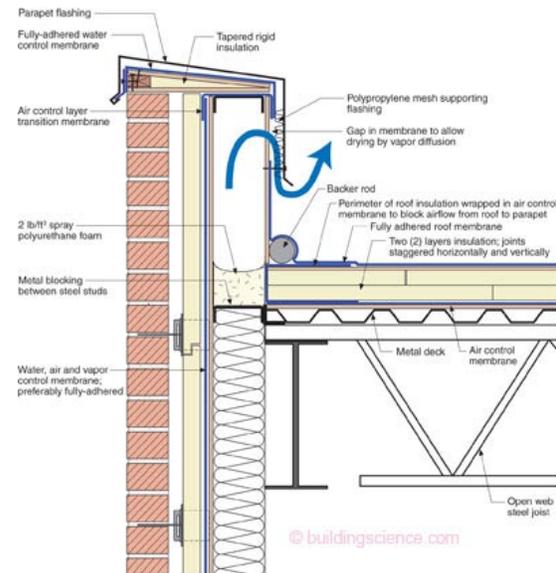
The Balloon Framed Steel Stud Parapet— This is the ugliest parapet to get right. Notice the use of spray polyurethane foam, the high density stuff, to provide air control layer continuity across the balloon framed exterior steel stud wall. The spray foam is supported by horizontal bridging or metal blocking. This is a tricky thing to execute and, as such, we design into the upper parapet assembly a pathway for drying via diffusion to provide some performance redundancy.
